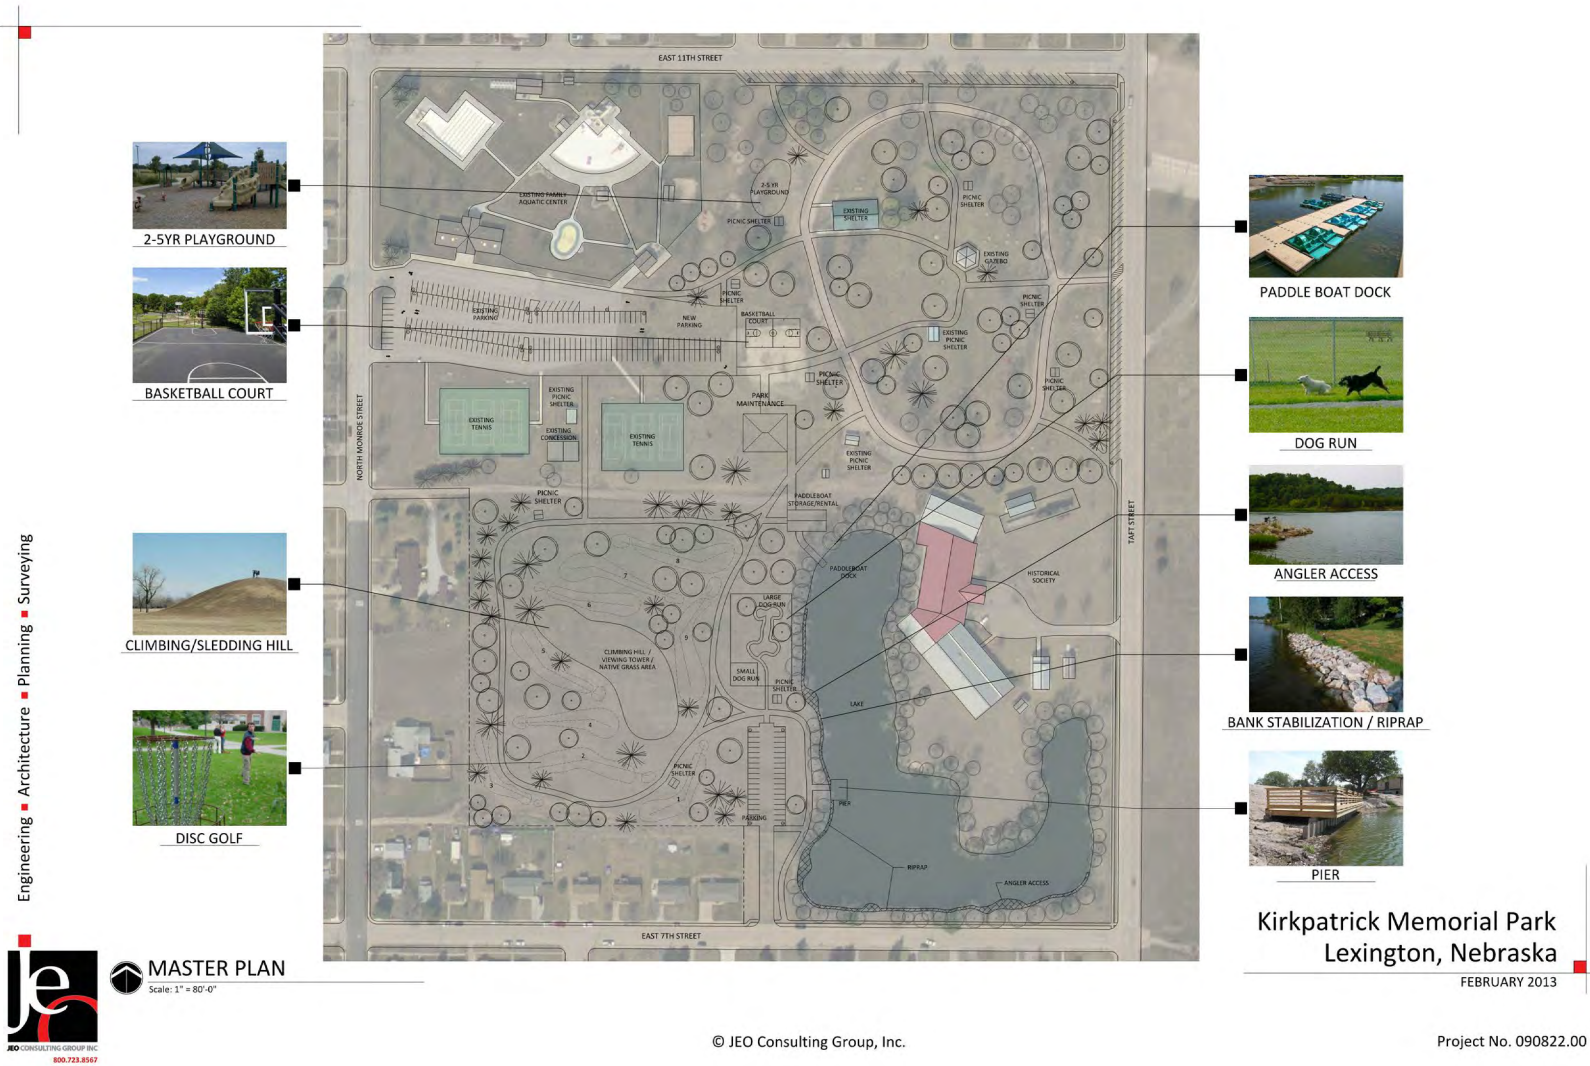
Kirkpatrick Memorial Park proposed Master Plan, Lexington
